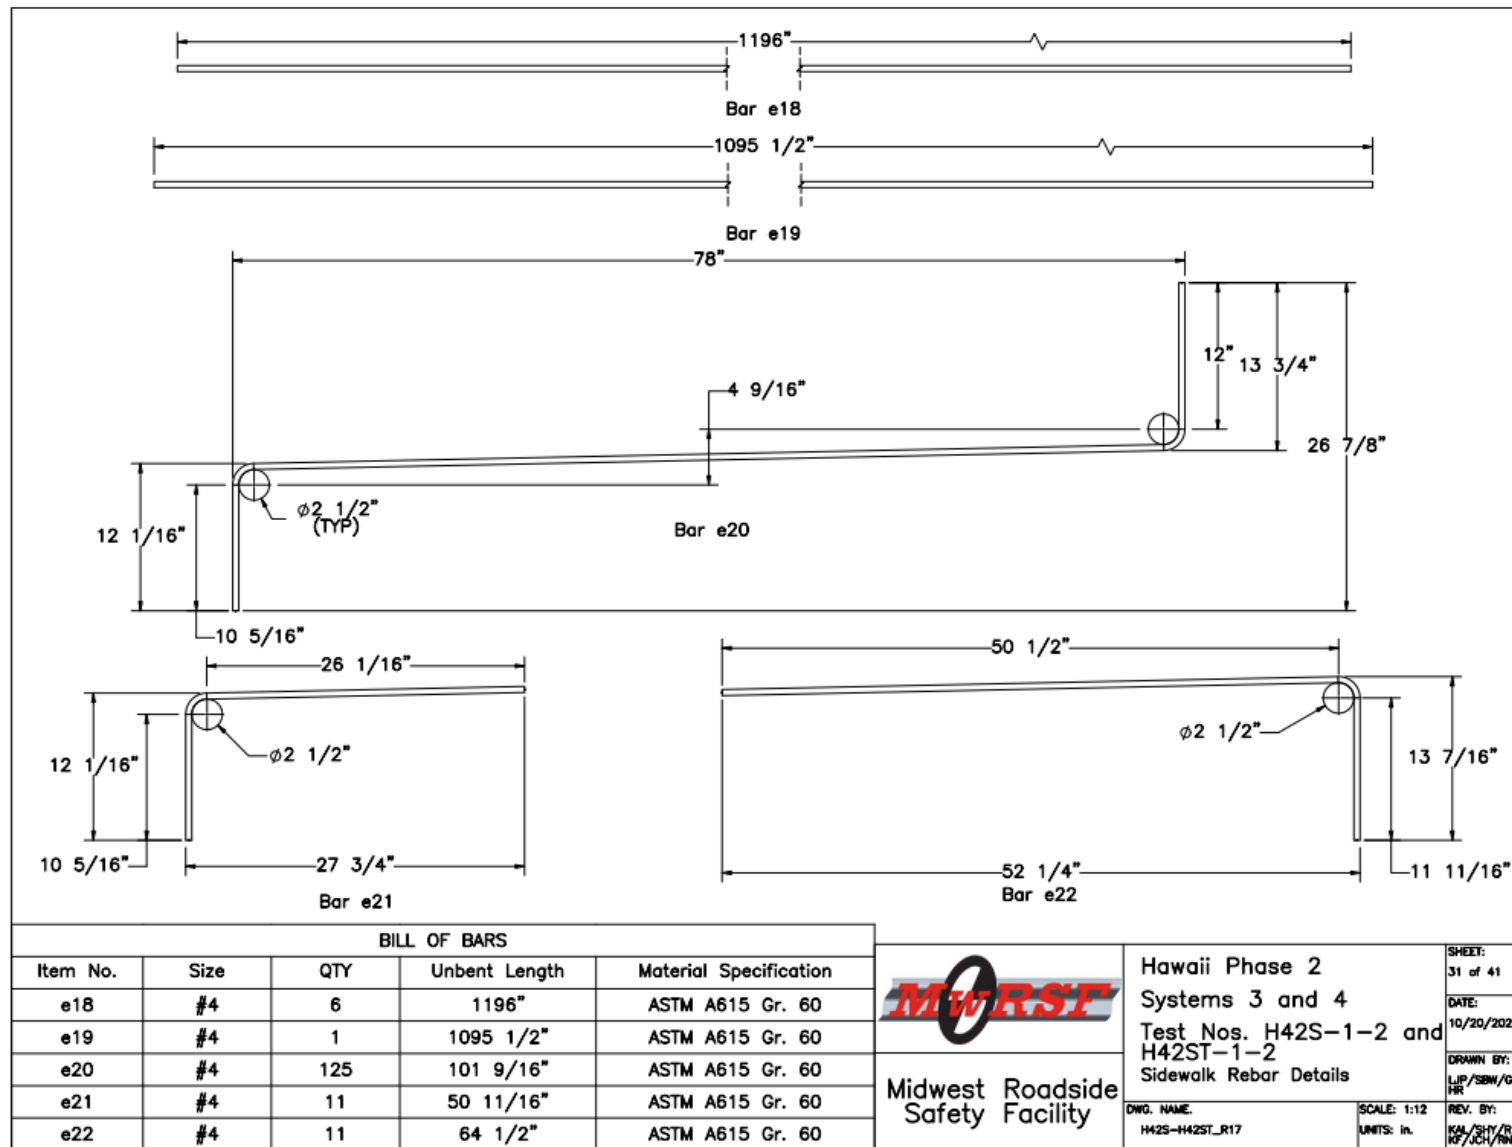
Sidewalk Rebar Details, Test Nos. H42ST-1 and H42ST-2
